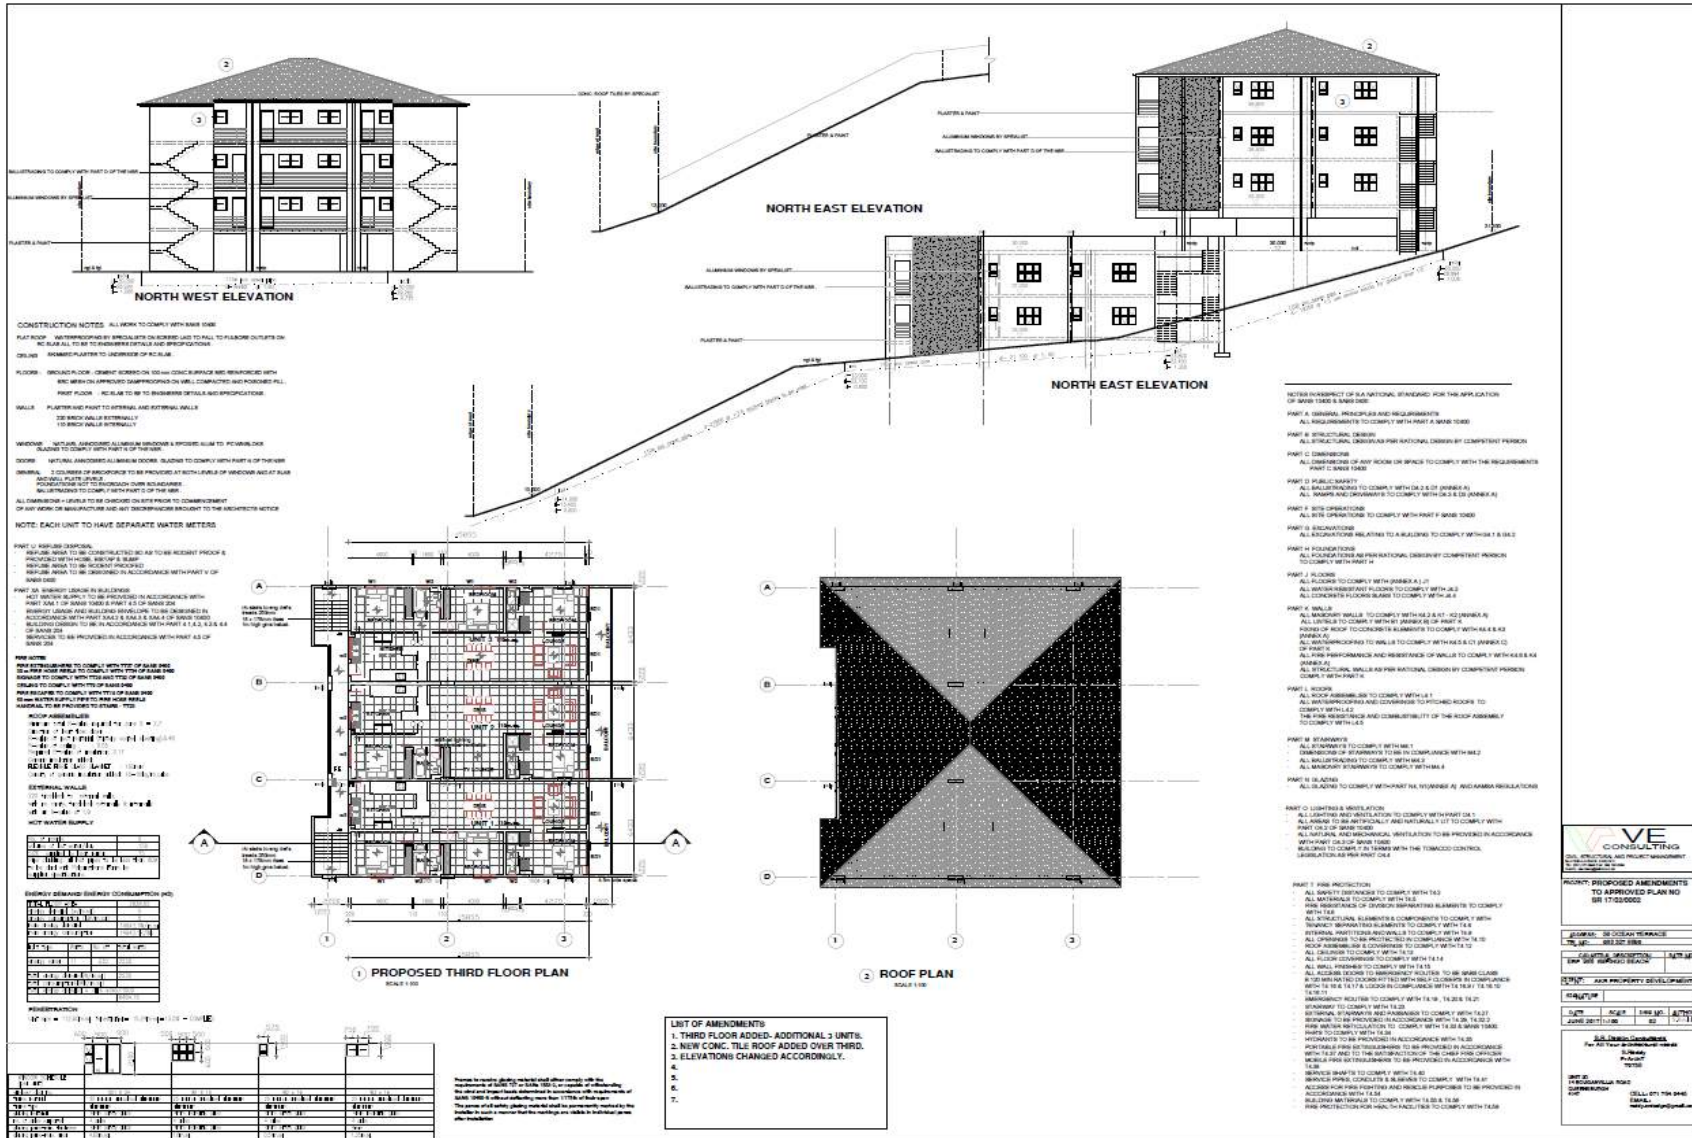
Layout 2 – Development Plan of the Third Floor (Drawing No. SR17/02/0002)
